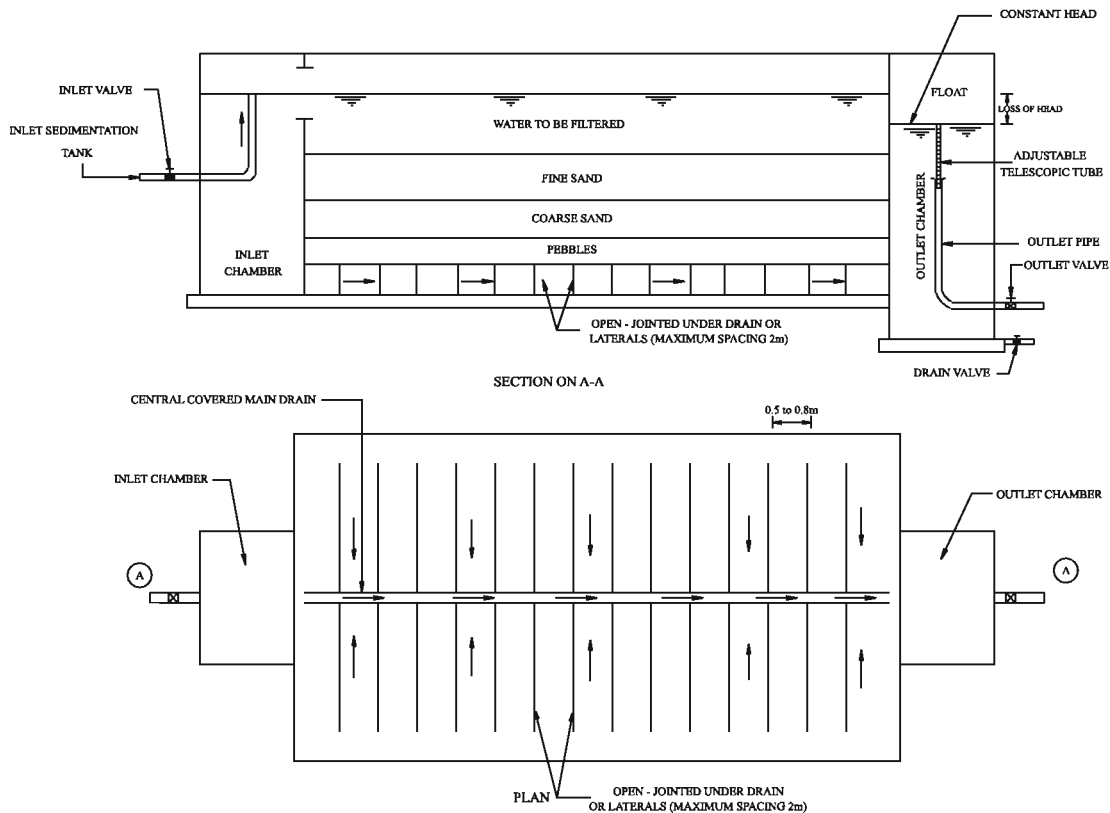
PLAN & LONGITUDINAL SECTION OF A SLOW SAND FILTER
